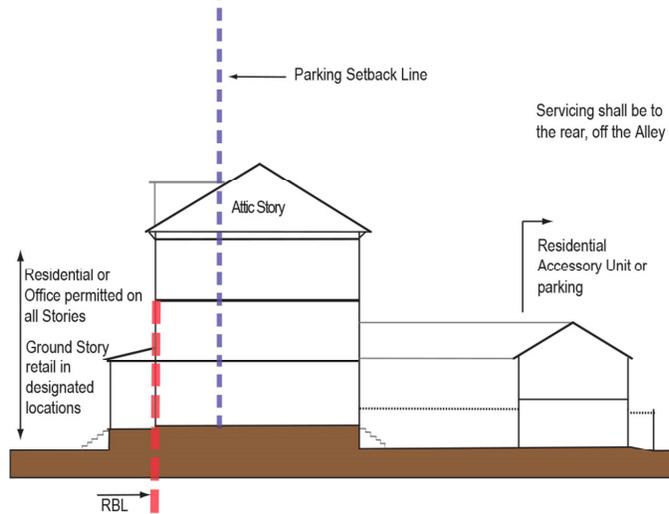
Townhouse/Small Apartment Use Standards
